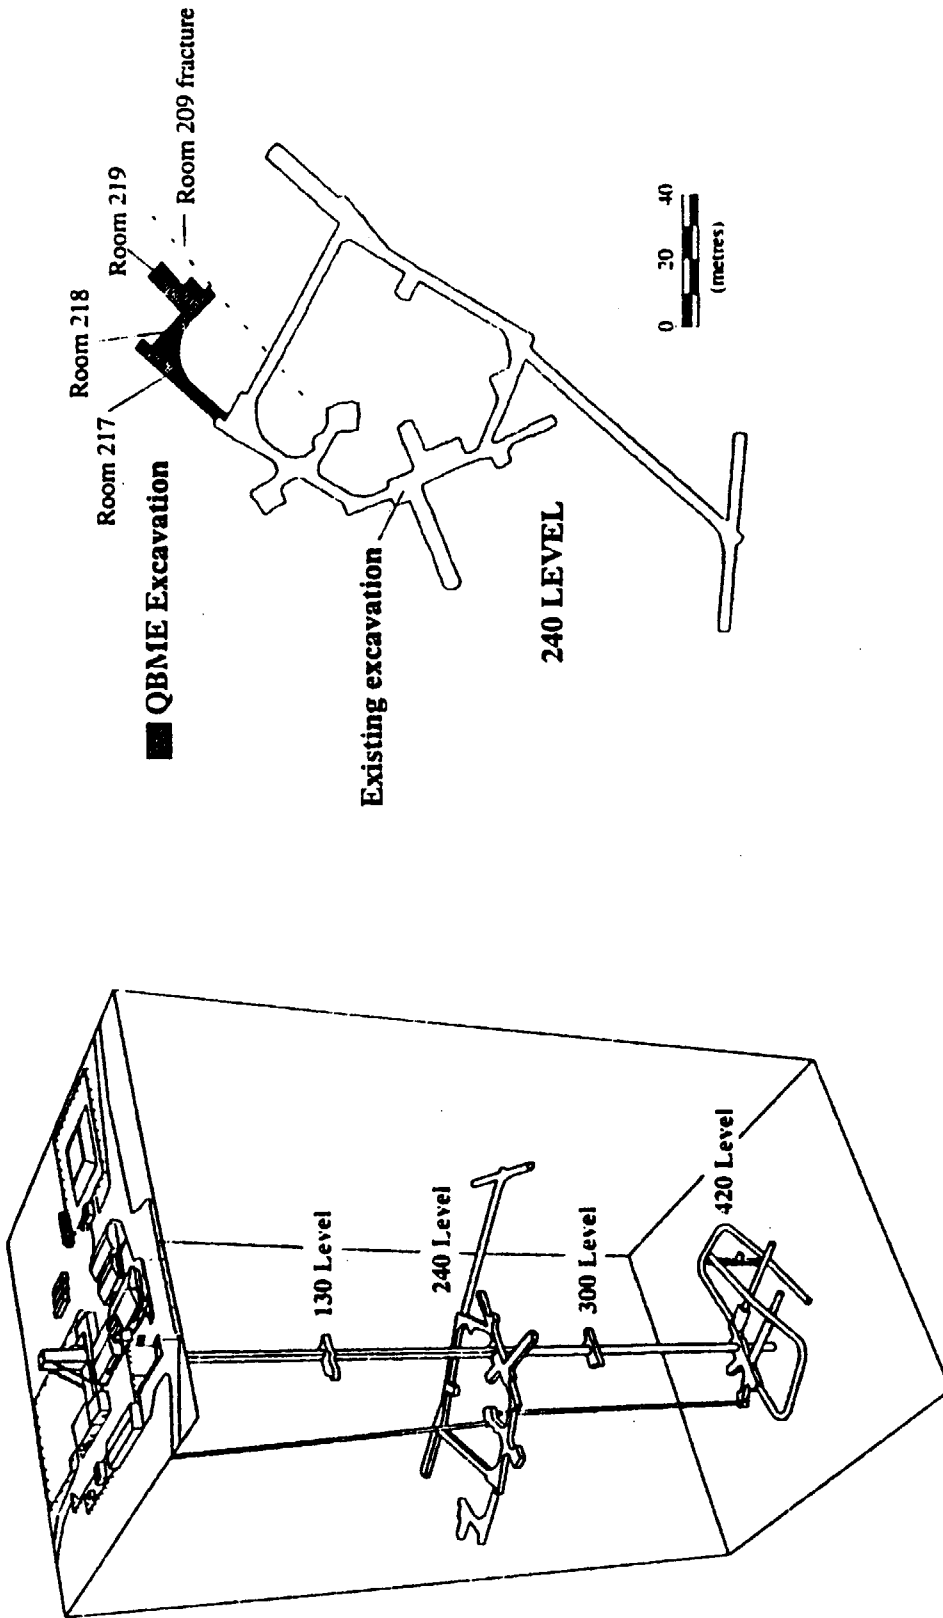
Isometric view of the Underground Research Laboratory and plan view of the 240m level showing locations of the QBME excavation.
